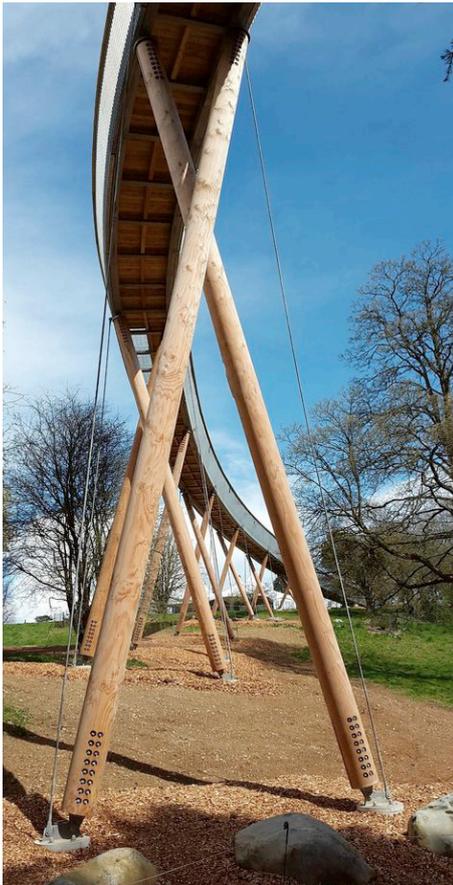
Glenn Howells Architects. *STIHL Treetop Walkway*. Westonbirt, United Kingdom (2016). Photograph: Parrish, R. 2016.
